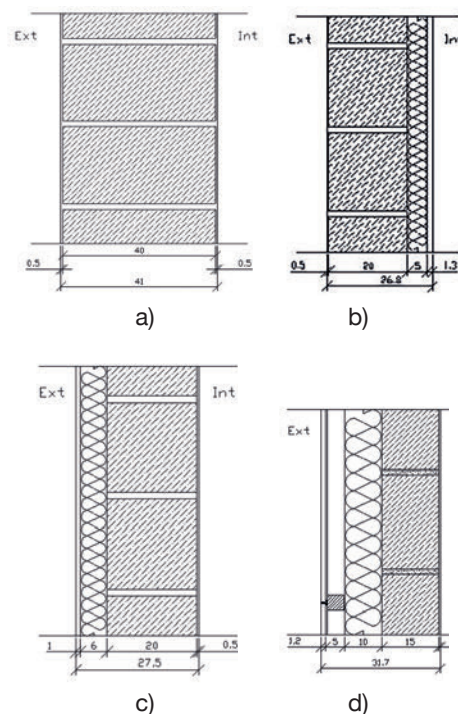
Adobe / Rammed earth walls: a) traditional structural; b) non-structural with interior insulation; c) non-structural with exterior insulation; d) non-structural with exterior insulation and ventilated façade
